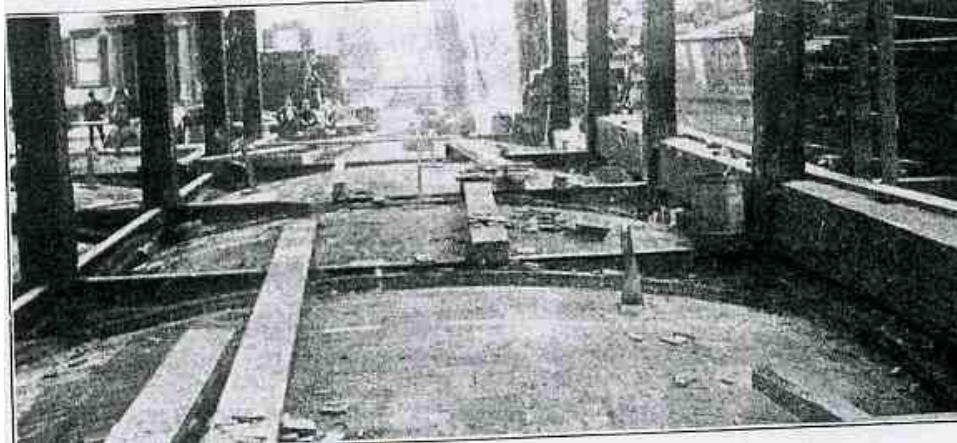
The vaulting method applied to construct ceiling and floor in a large building
